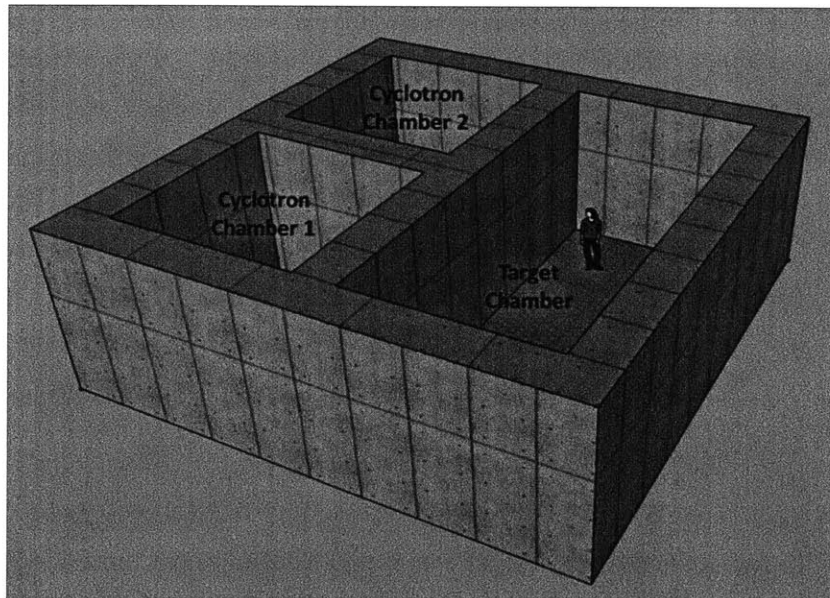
MCNPX facility layout consisting of three chambers (two cyclotrons and target chamber) and concrete shielding walls. Roof not shown for visual purposes.
